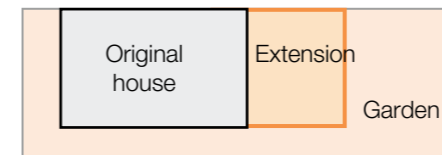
Overall extension footprint must not exceed 50% of the original garden space.
